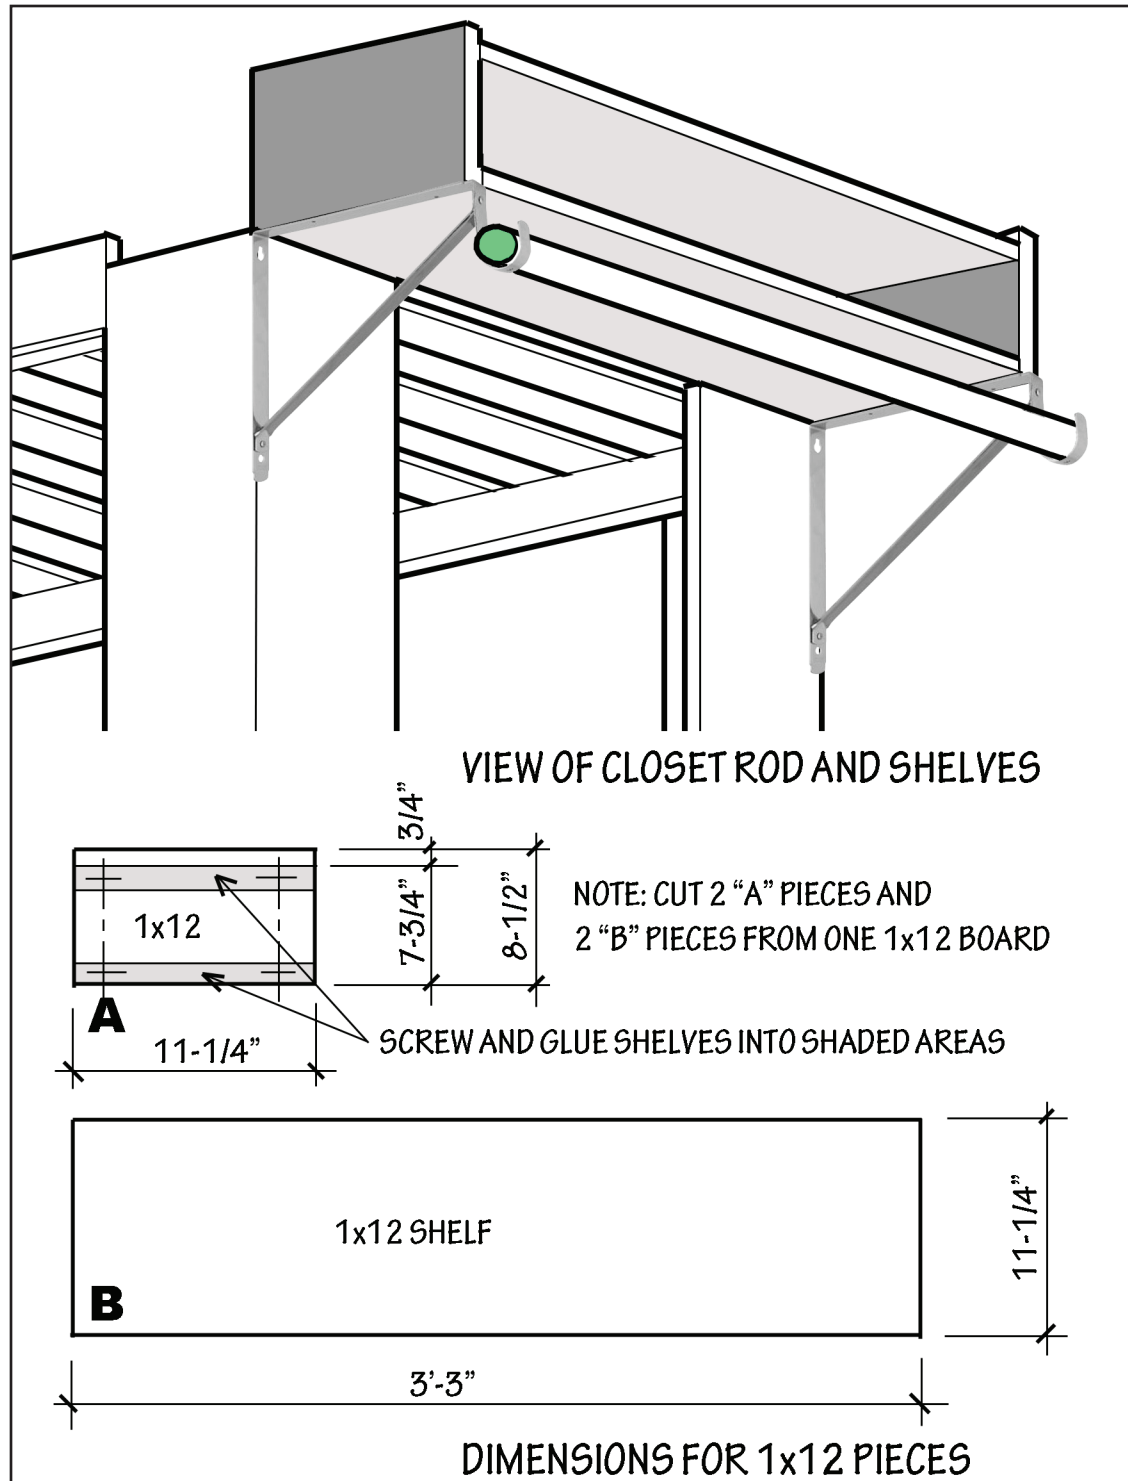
Optional closet rod brackets can support shelves and a closet rod.
